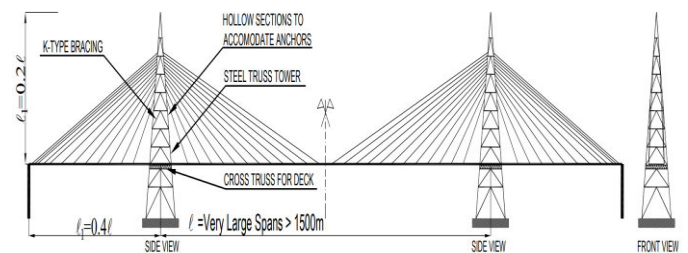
Cable Stayed Bridge with Steel Trussed Pylon
